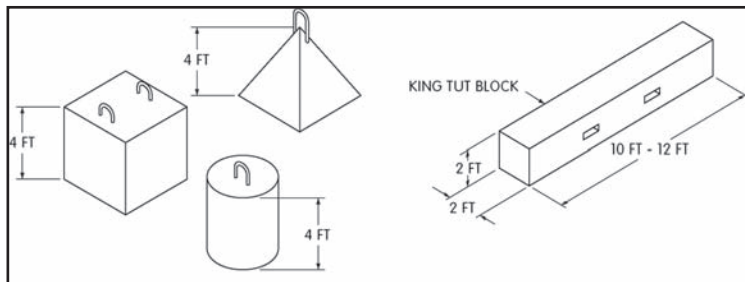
Typical Cabled Concrete Blocks (UFC 4-0222-02)
